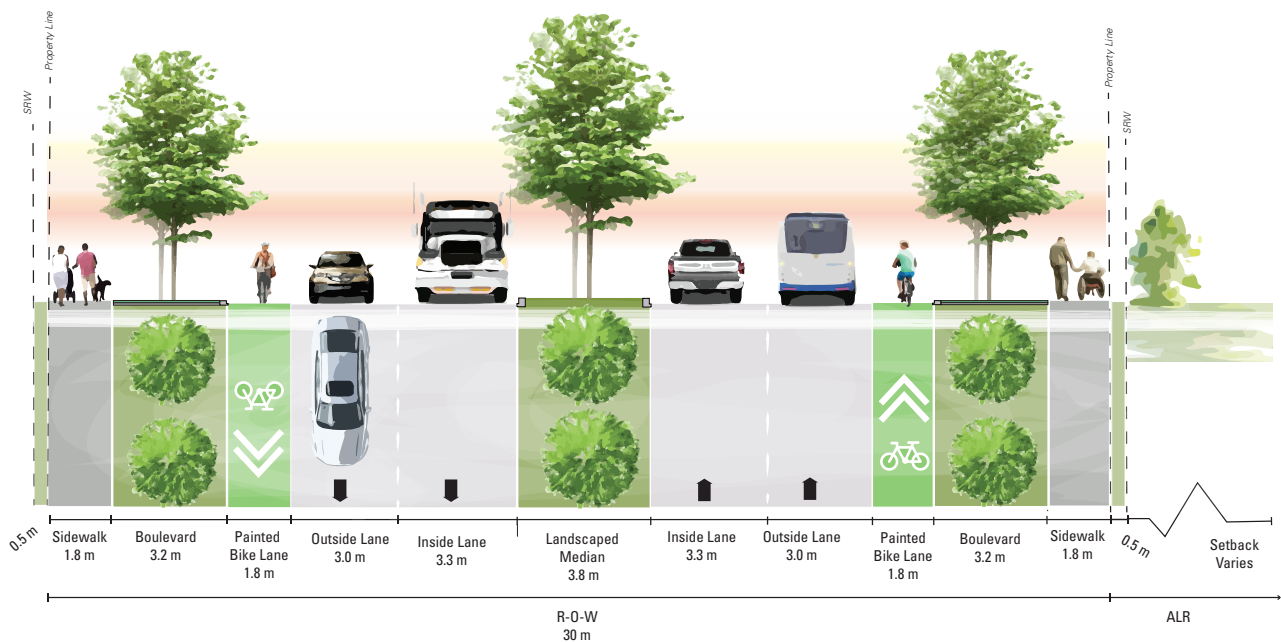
Arterial Standard - 32 Ave/184 St 30 m Cross-section
